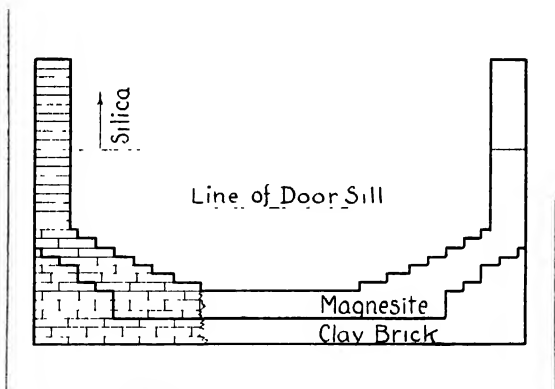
Second Method of Building Hearth by Offsetting Brick
